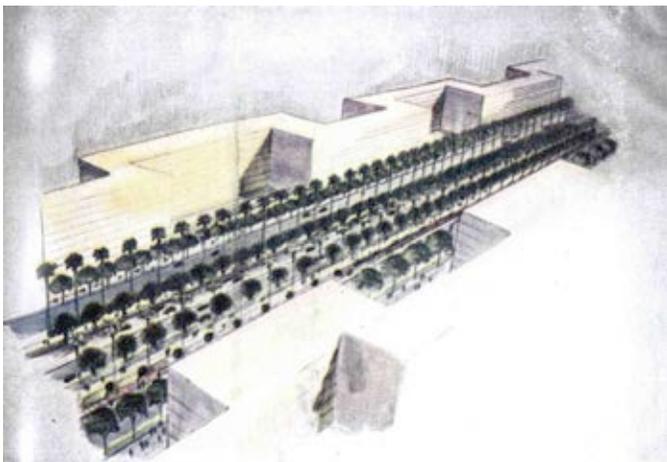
CPC, Presidente Vargas Avenue, Section 1 *RME (July, 1941) p.259
